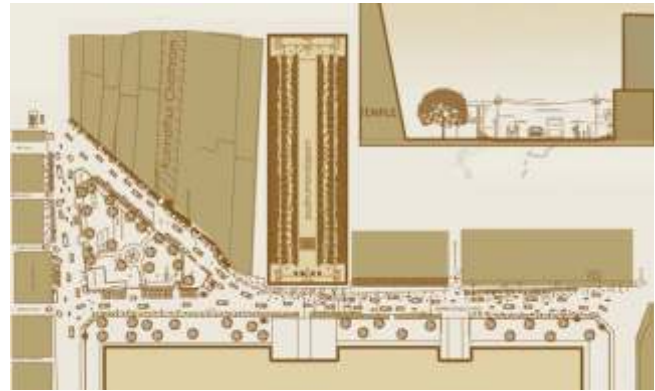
East Chithirai Street – Road section - Earlier
